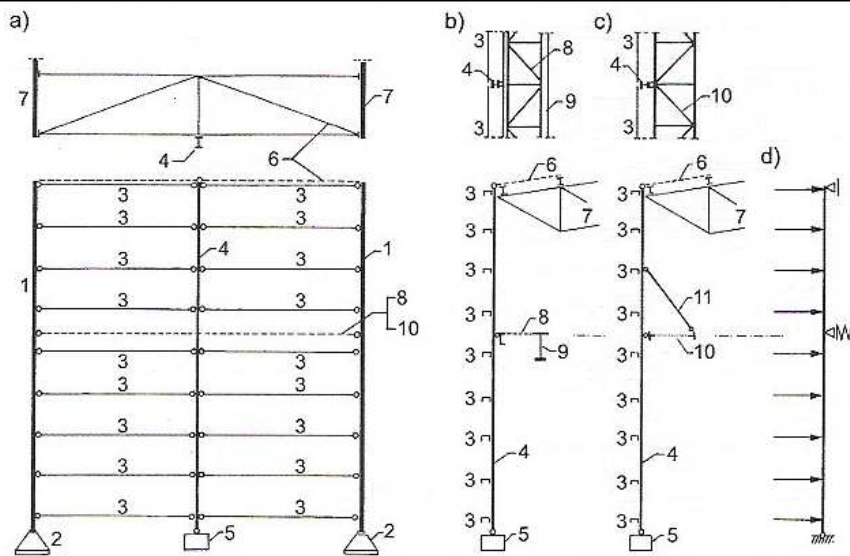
Construction of high sidewalls: 1- primary column, 2,5- foundations, 3- wall girt, 4- secondary column, 6- longitudinal roof bracing, 7- roof rafter, 8- lateral runway bracing, 9- runway beam, 10- horizontal sidewall bracing, 11- suspension rod
